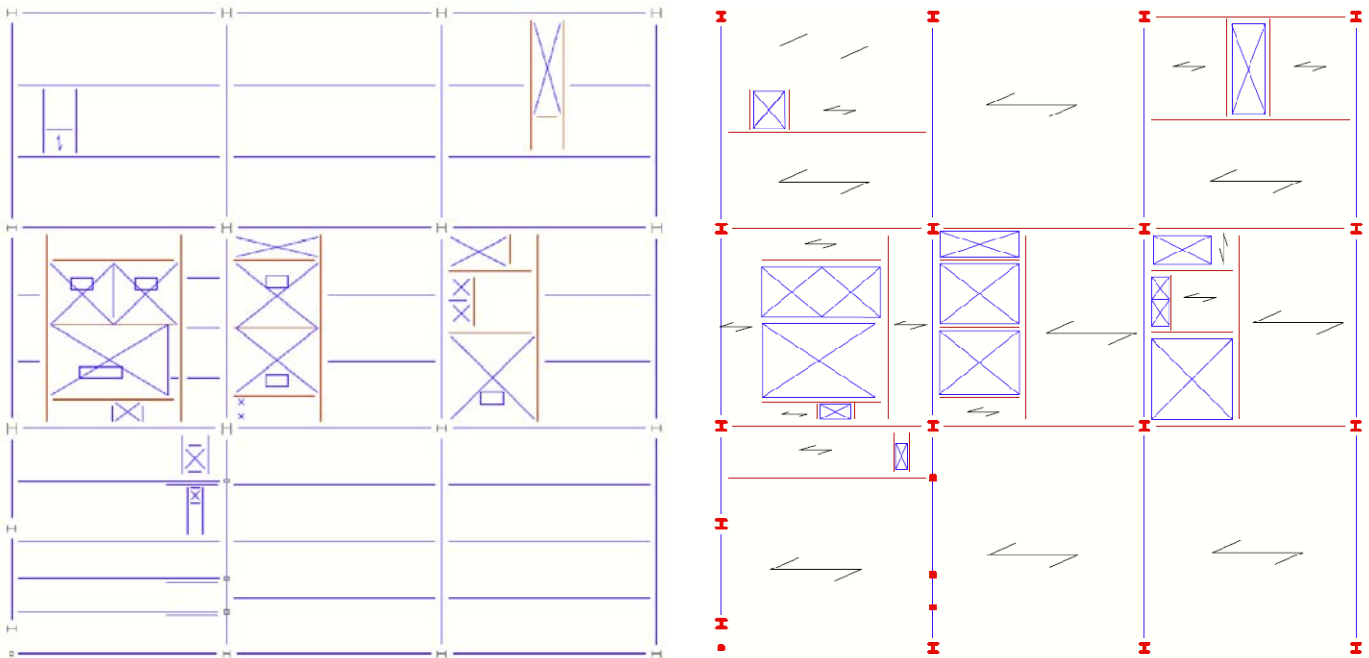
& 4.27: Partial 3<sup>rd</sup> floor as designed column layout with girders; proposed column layout with girder direction and spacing.
